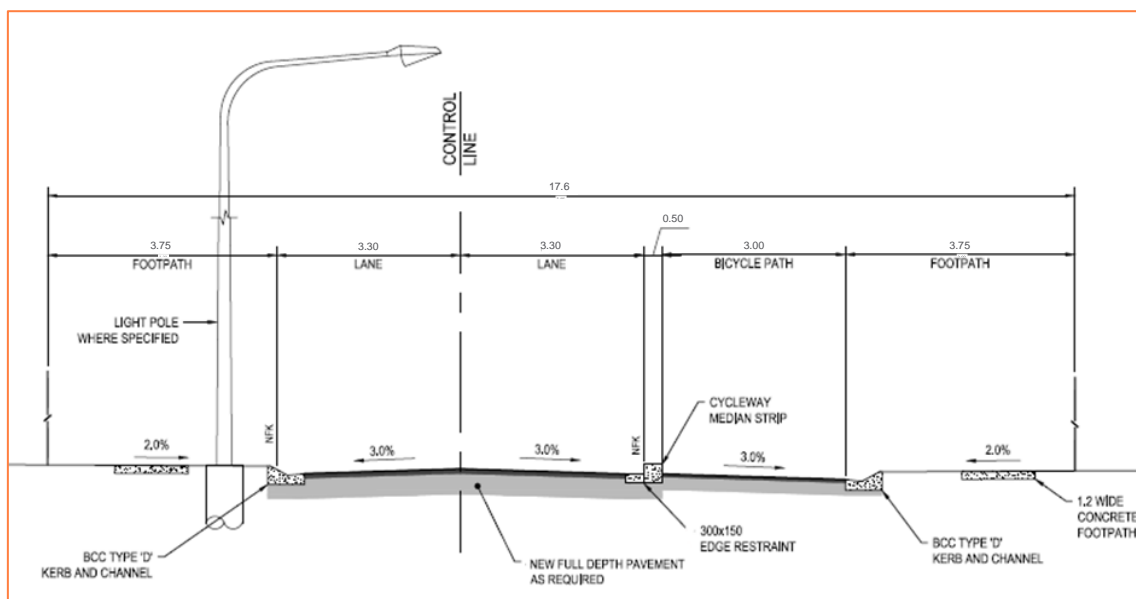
Possible Cross Section with no Parking and Separated Bicycle Facility (17.6 m)
